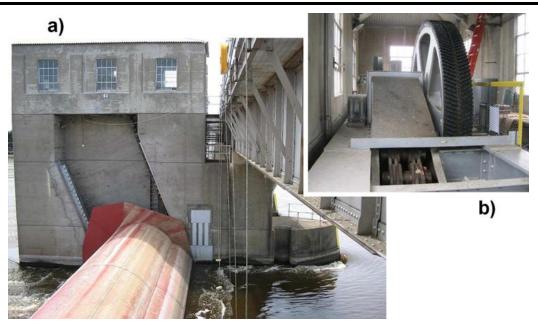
Roller gates on the Mississippi, drive machinery: a) driven end and machine room on pier; b) view inside machine room
